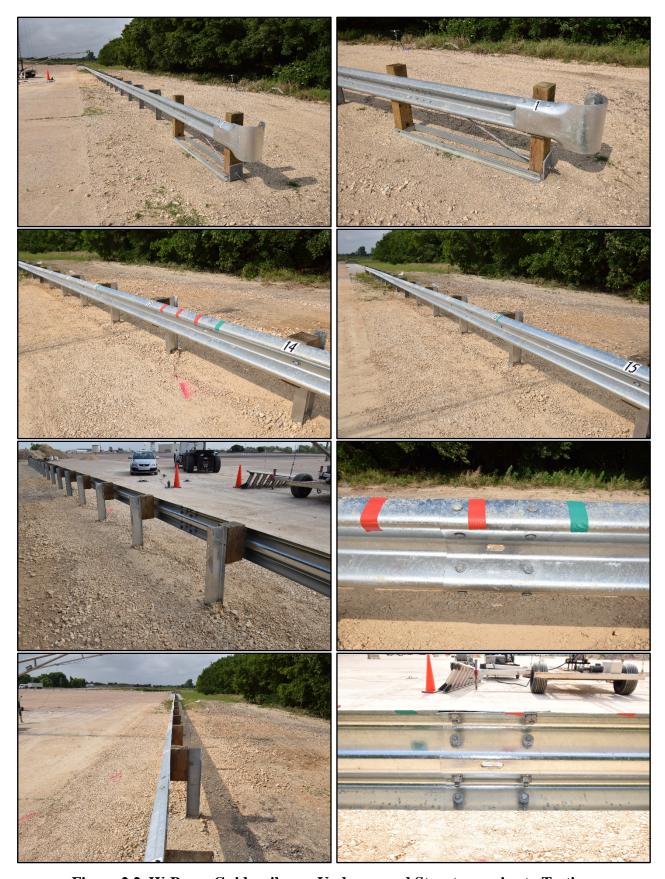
W-Beam Guiderail over Underground Structure prior to Testing.
